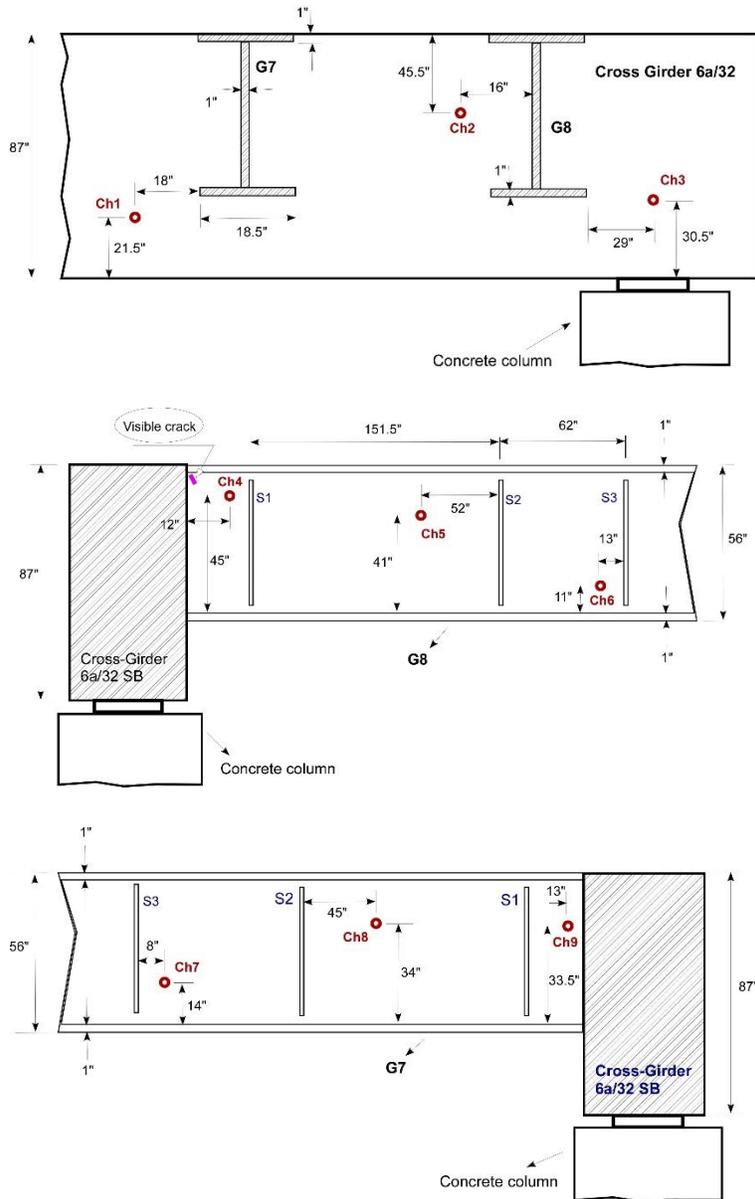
Diagram of sensor positions on cross girder #6A/32SB (top), girder #8 (middle), and girder #7 (bottom).
